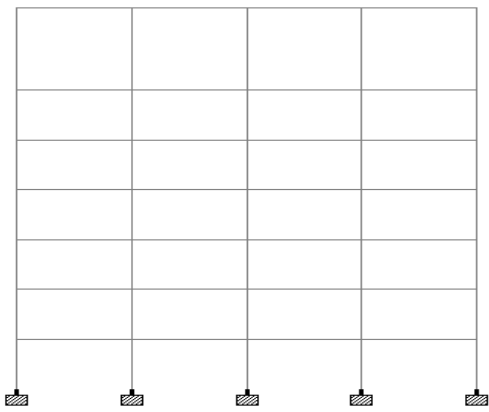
elevation view of building with soft story at top in STAAD.Pro
